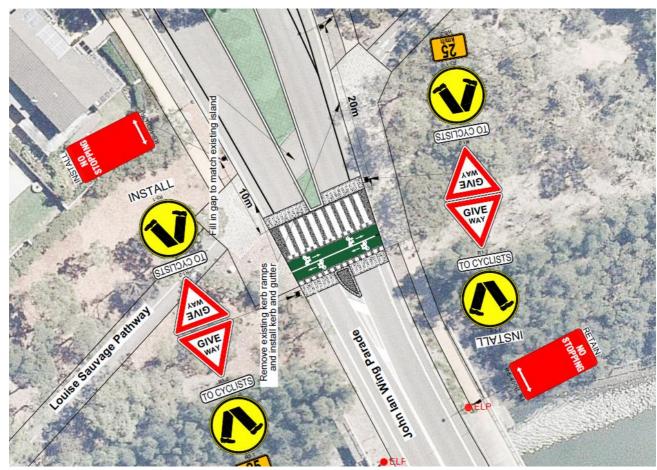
Concept plan of the proposed raised combined pedestrian and cyclist crossing in John lan Wing Parade at Louise Sauvage pathway, Sydney Olympic Park
